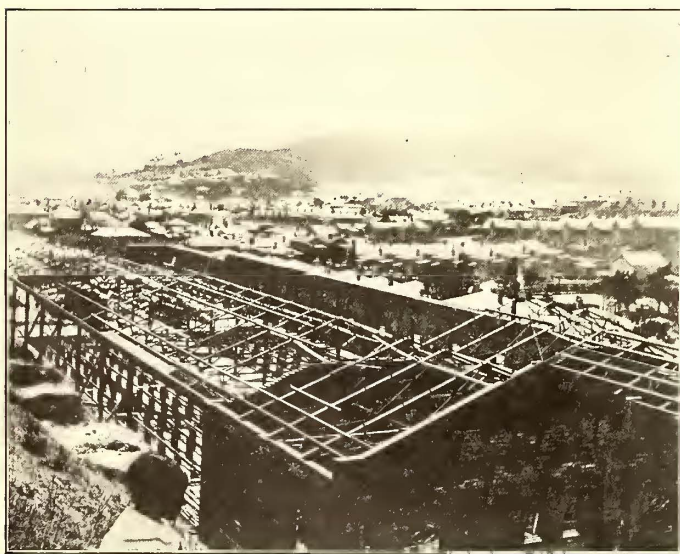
VIEW OF NEW CAR HOUSE UNDER CONSTRUCTION
